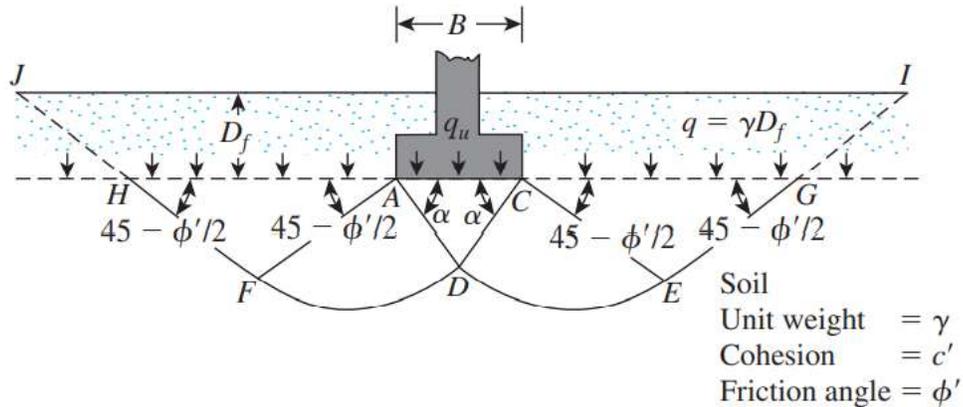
Bearing capacity failure in soil under a rough rigid continuous (strip) foundation (Barja.M.Das (2011)).
